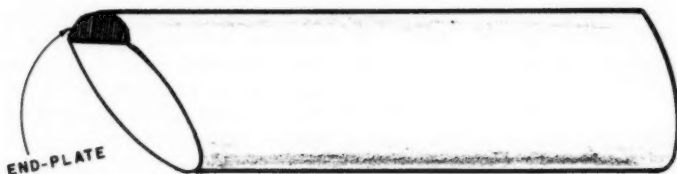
CANOPY INLET FOR CLOSED CONDUITS.
